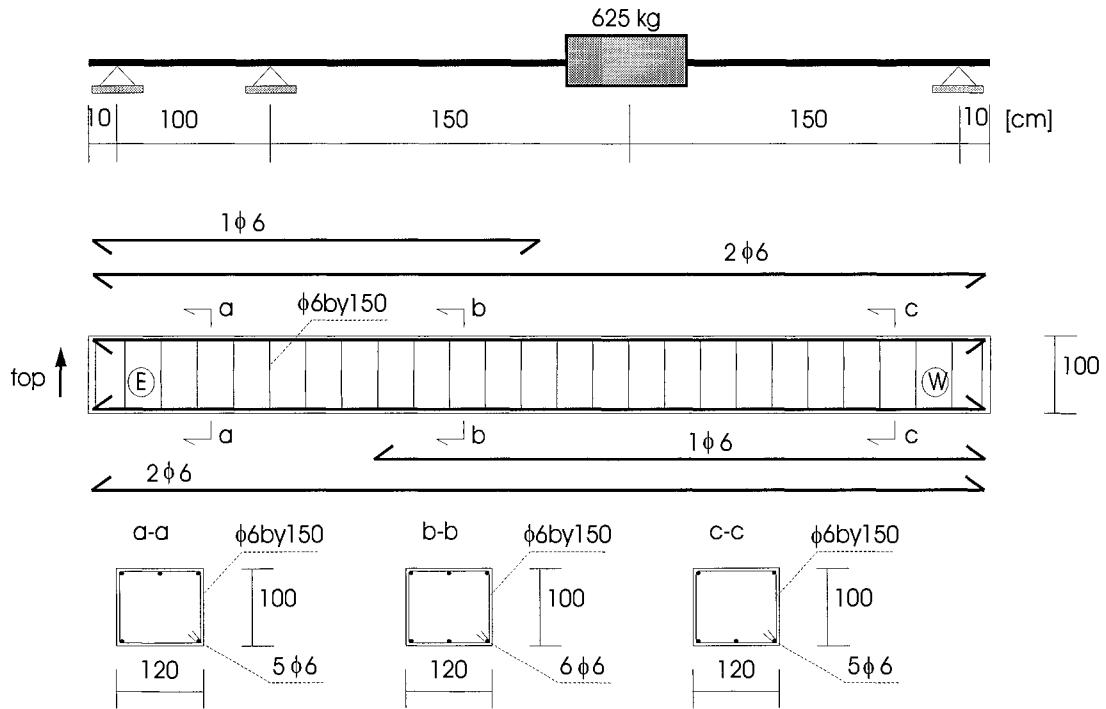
Beams geometry with detailed dimensions and reinforcement
